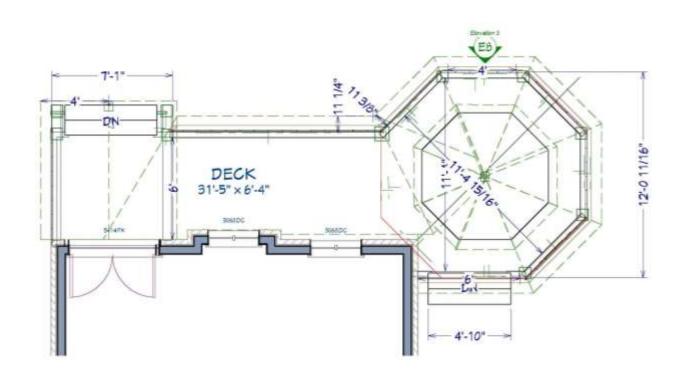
Architectural plan drawing of new porch at 529 Princess Avenue
